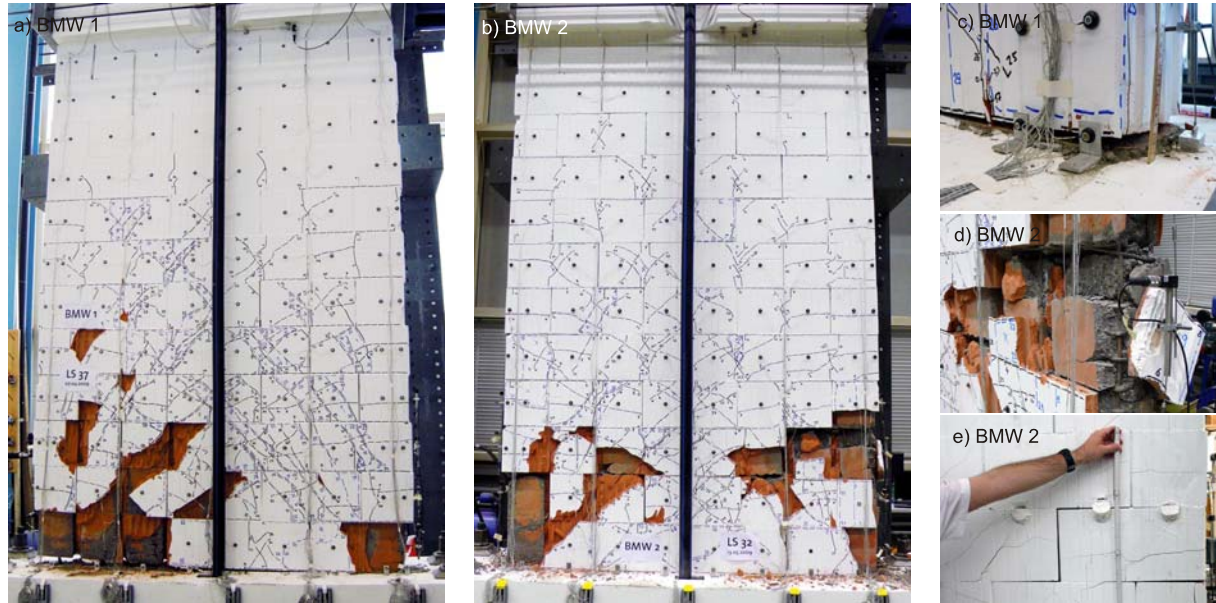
Photos of the test units: Final crack pattern of BMW1 (a, $\delta = 2.66\%$) and BMW2 (b, $\delta = 2.00\%$), joint between foundation and BMW1 (c, $\delta = 2.66\%$), flexural failure of BMW2 due to fracture of the longitudinal reinforcement in the fourth joint above the foundation (d, $\delta = 2.00\%$), rotation of the bricks of rows 3 and 4 of BMW2 (e, $\delta = 1.00\%$).
